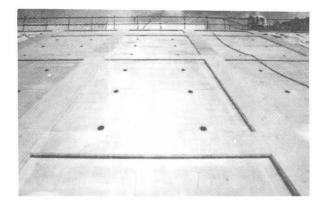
Inclined retaining wall of Aseishigawa dam (Aomori pref.) [2]
